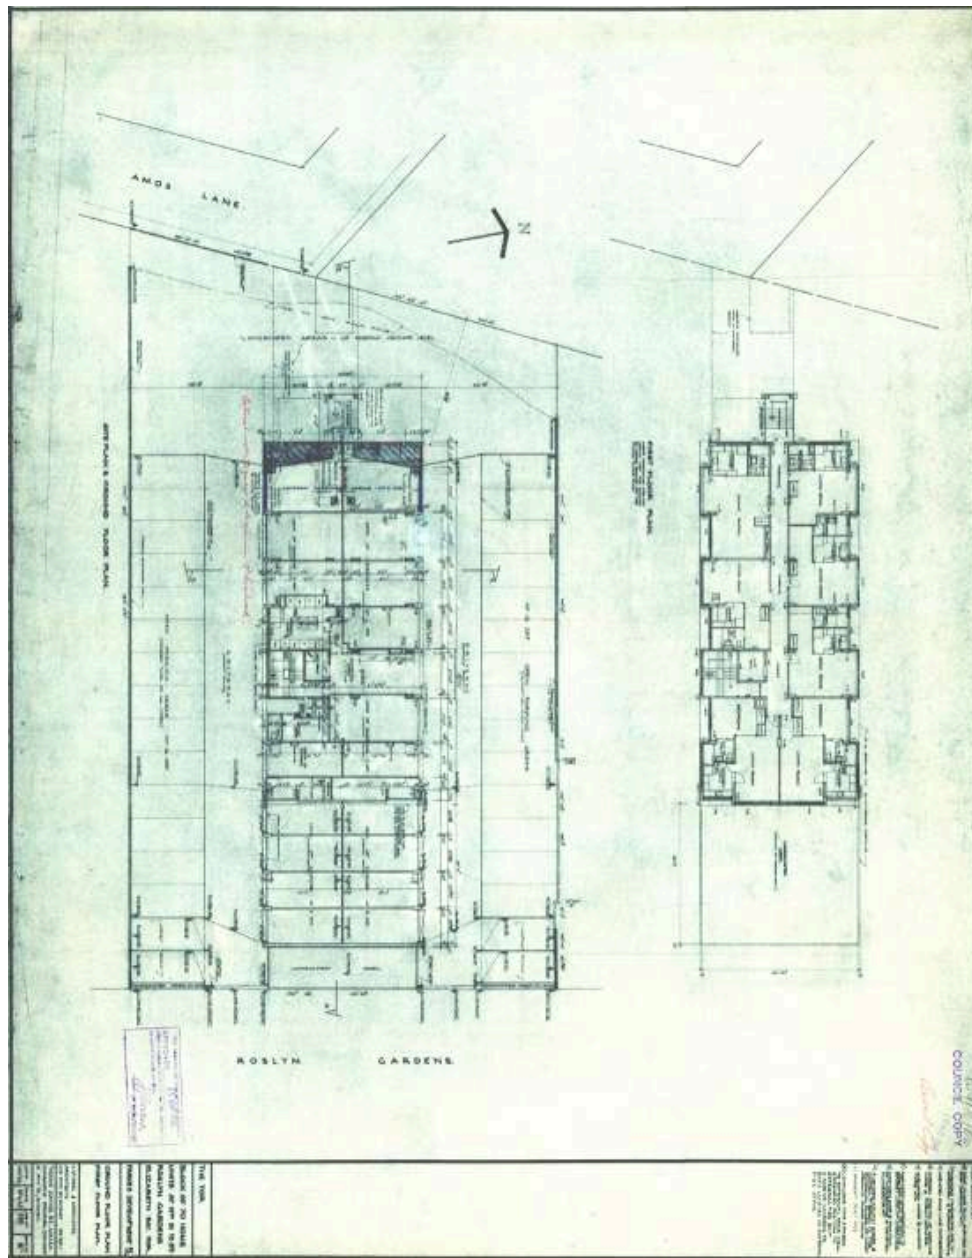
Block of 70 Home Units at Nos 51-59 Roslyn Gardens, Elizabeth Bay, NSW. Ground floor plan and first floor plan, by H Stossel and Associates, dated November 1964, approved 25th May 1966 for Parkes Development P/L
